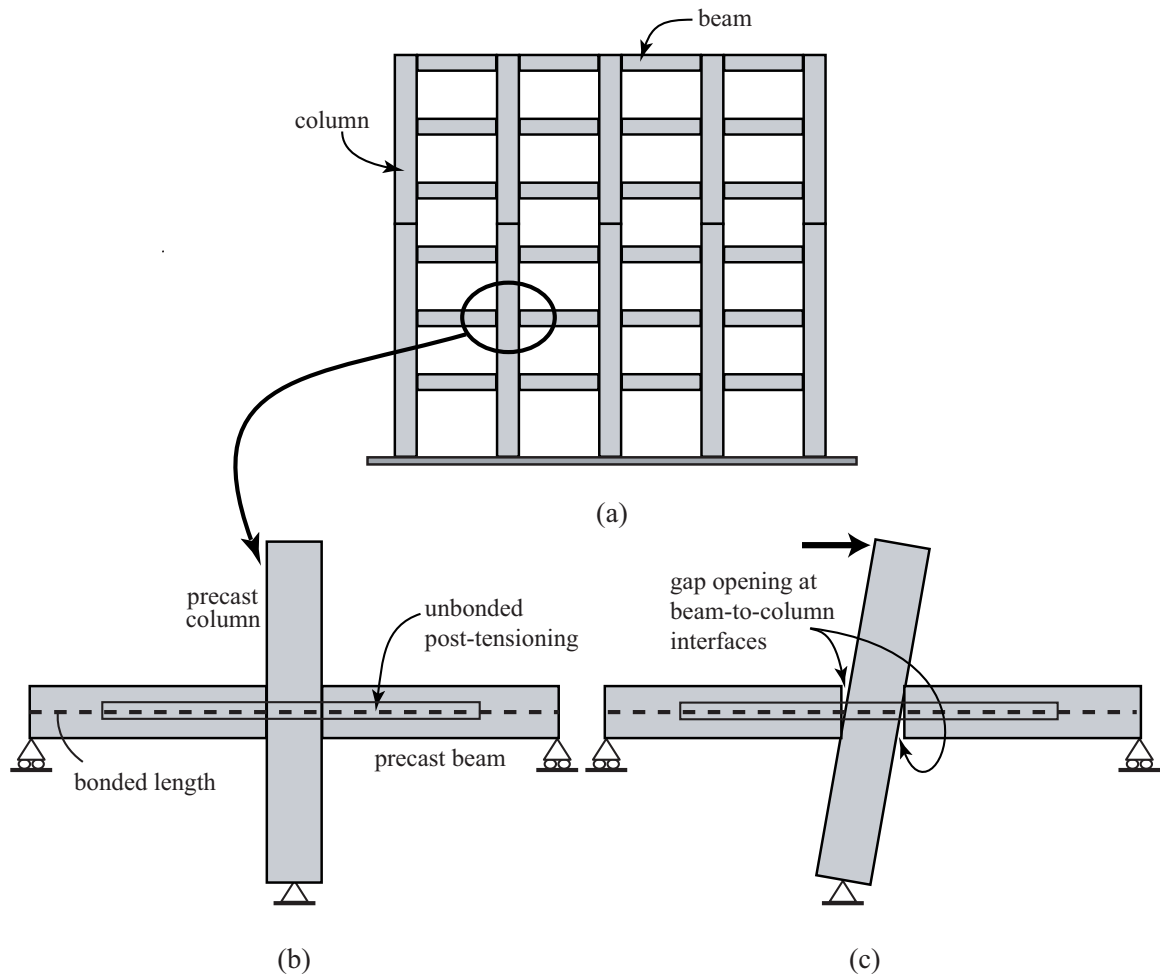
Unbonded post-tensioned precast concrete frame: (a) elevation; (b) beam-column subassembly; (c) idealized exaggerated displaced shape.
